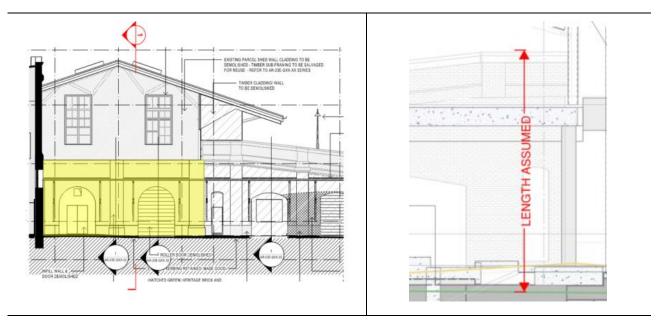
Elevation View of Heritage Masonry Wall on Ambulance Ave (BVN Dwg.AR-23B-G01-02[5]) With Assumed Footing Depths for Characteristic Height
